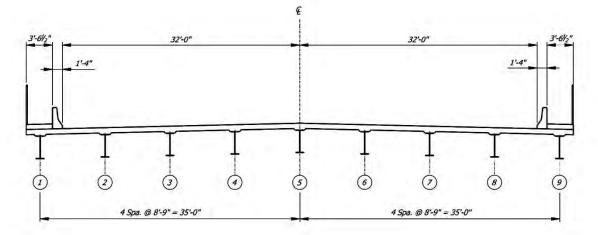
Cross-section view, looking north, indicating steel beam numbering in spans five to seven for Bridge Number 15558X. (Source: Missouri DOT)
